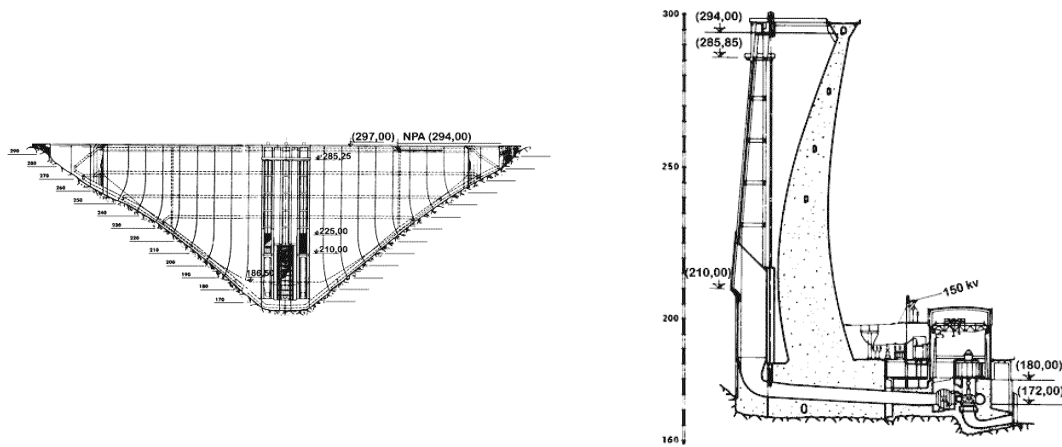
Elevation and cross-section by the central cantilever and intake tower.
